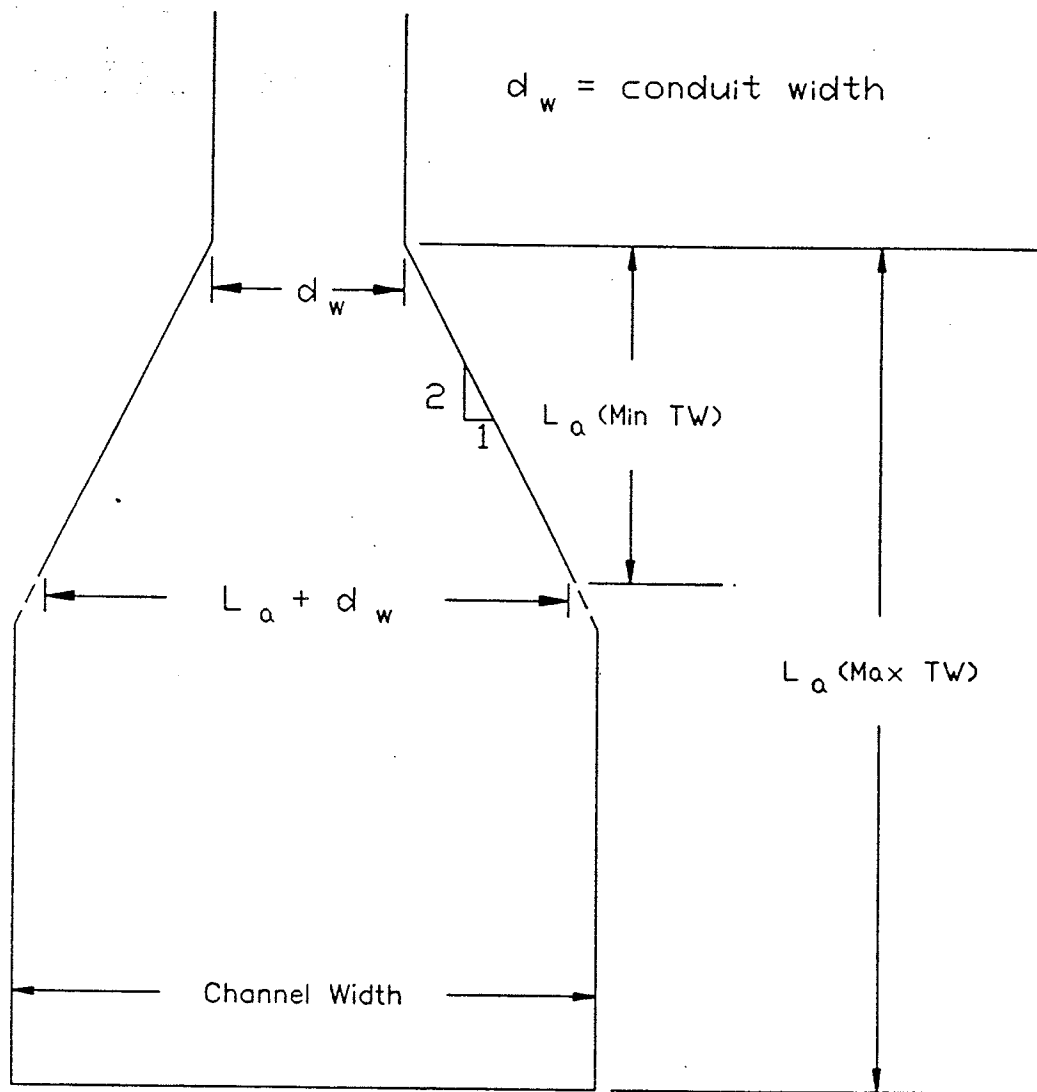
Outlet Protection with Minimum Tailwater Condition
